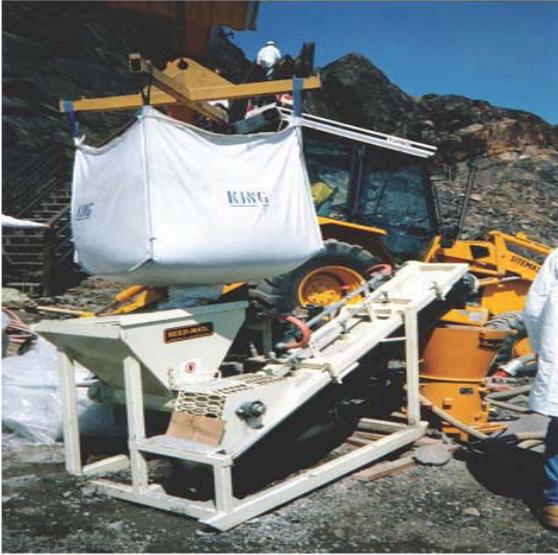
Bagged pre-mix dry shotcrete components being feed to hopper of shotcrete machine.
